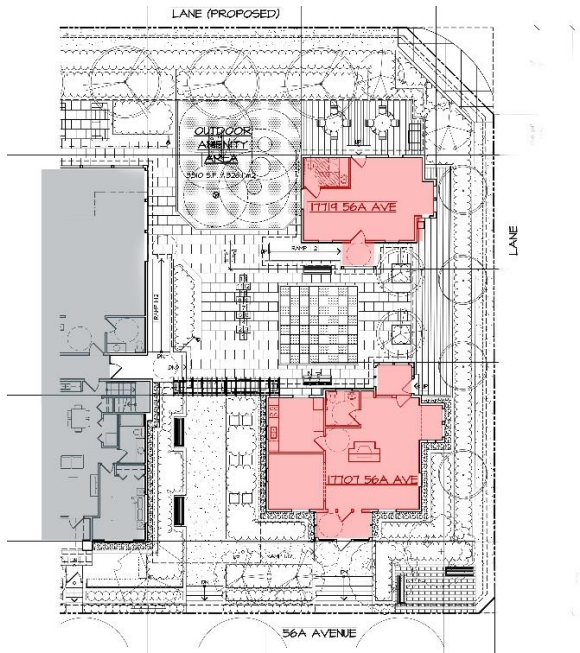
Proposed relocation of the Mooring House & Cottage with new development on the left (drawing by Barnett Dembek Architects Inc.)
